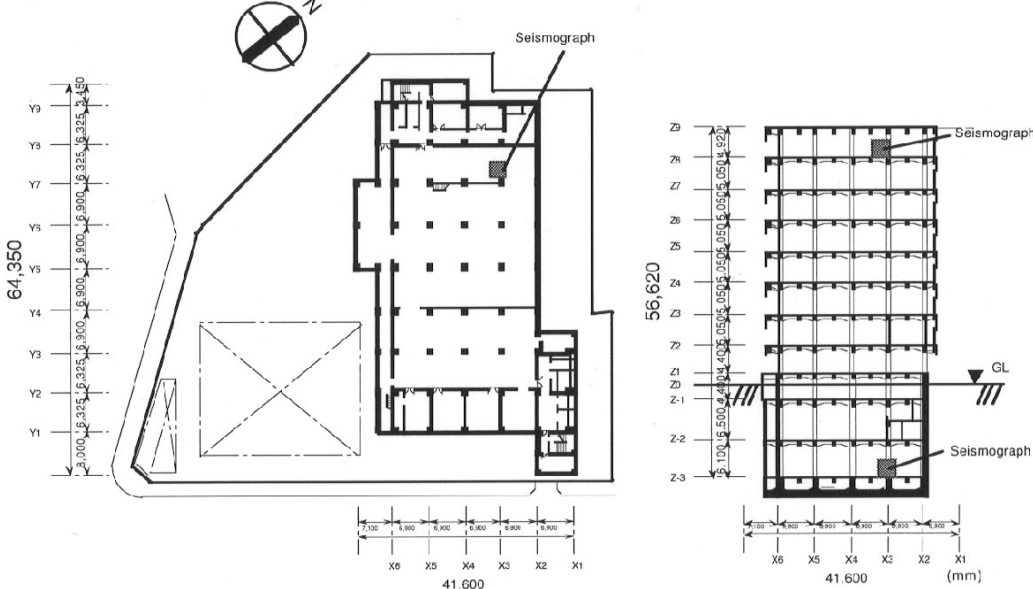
Plan and section view of NTT Kobe Ekimae Building and location of seismograph (in mm)
